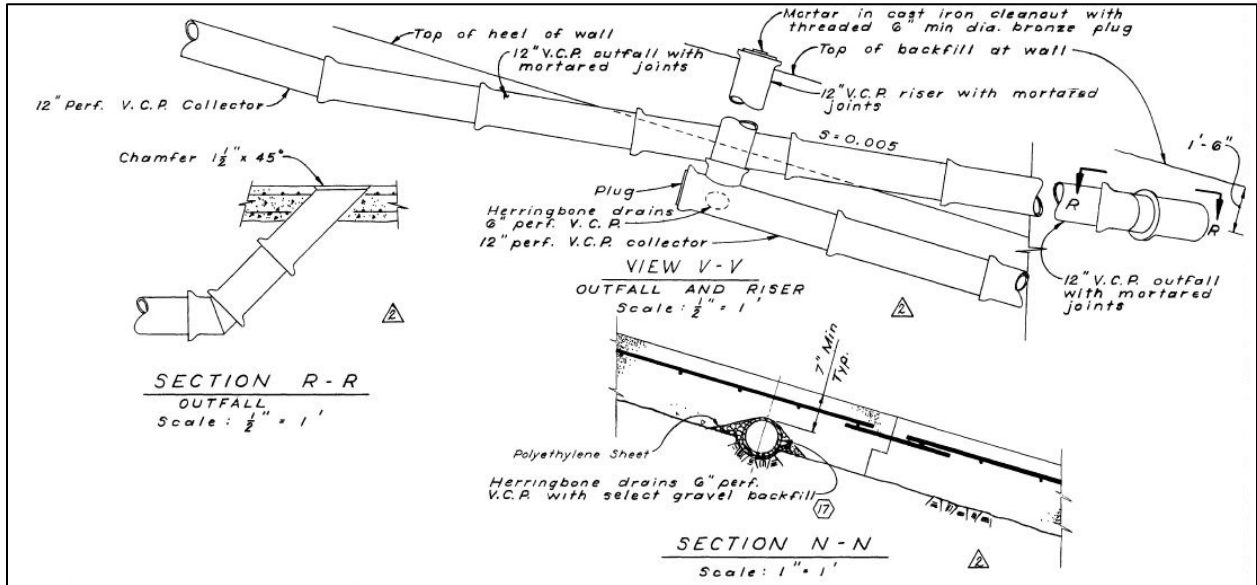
Herringbone (bottom) and Collector Drain Details (from Drawing A-3B9-1)
